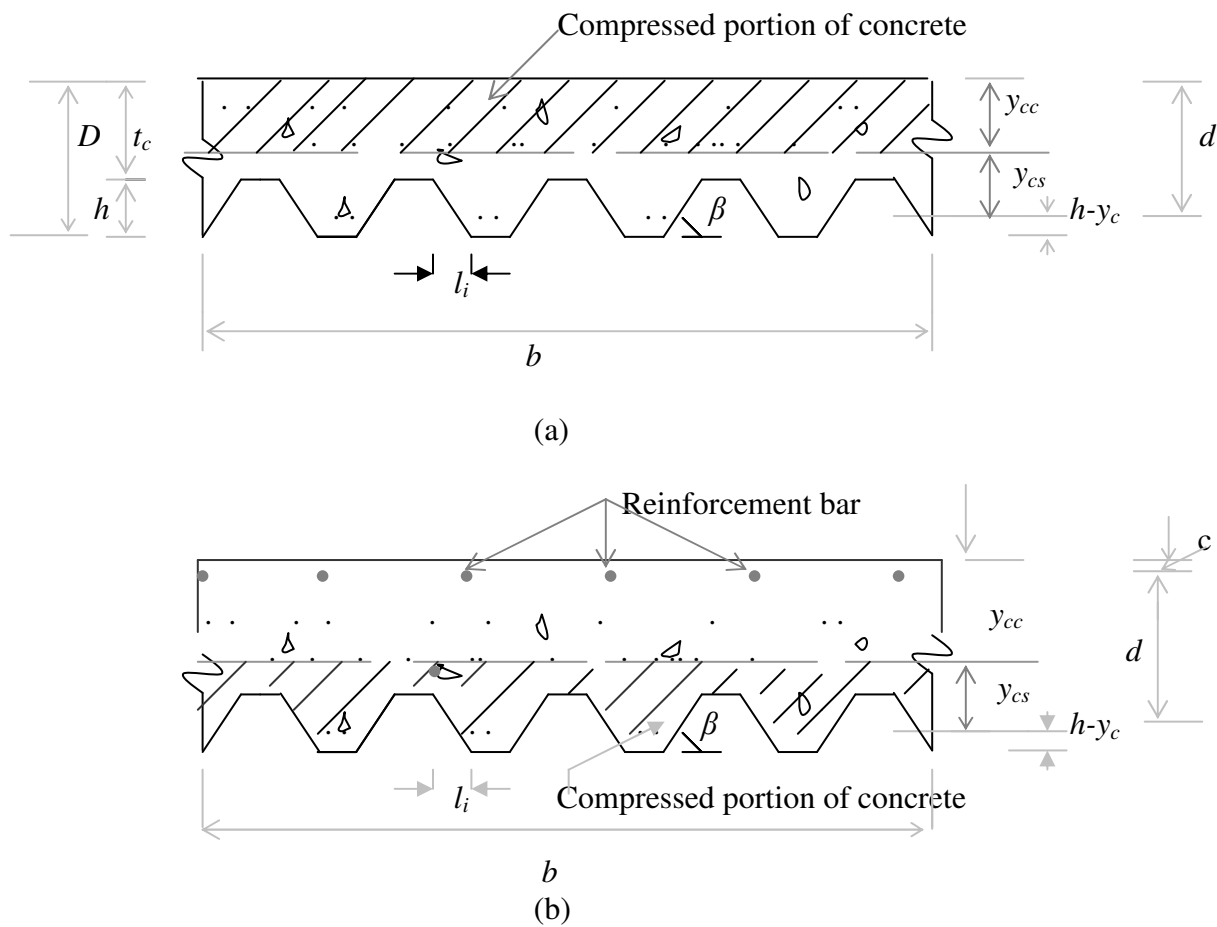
Typical cross-section of steel profile & concrete composite slab .
